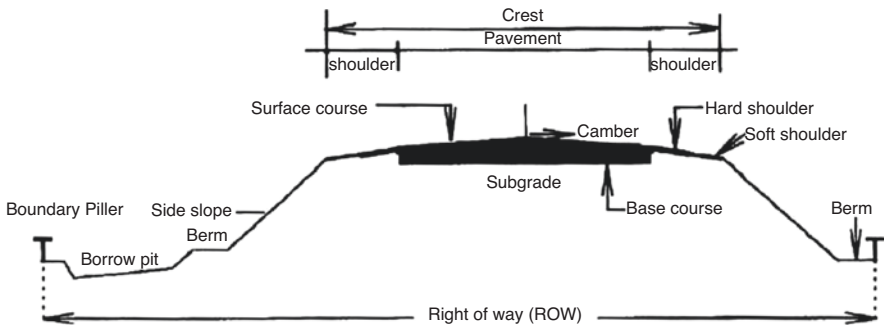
Typical cross section of a road structure (Source: RHD, Bangladesh)
